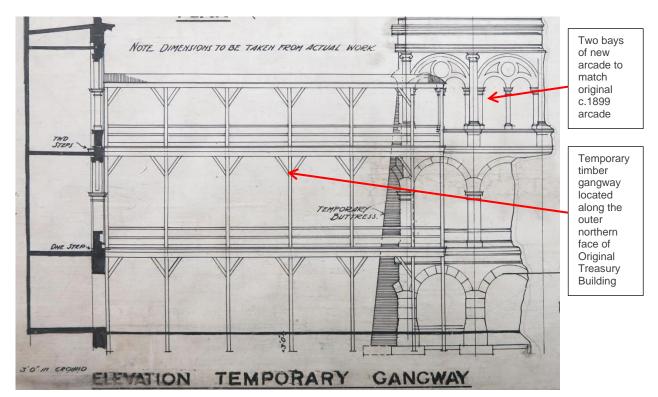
1916 George McRae proposed Plans – Elevation of temporary gangway looking south Source: State Records NSW, PB25/4110, dated 1916
